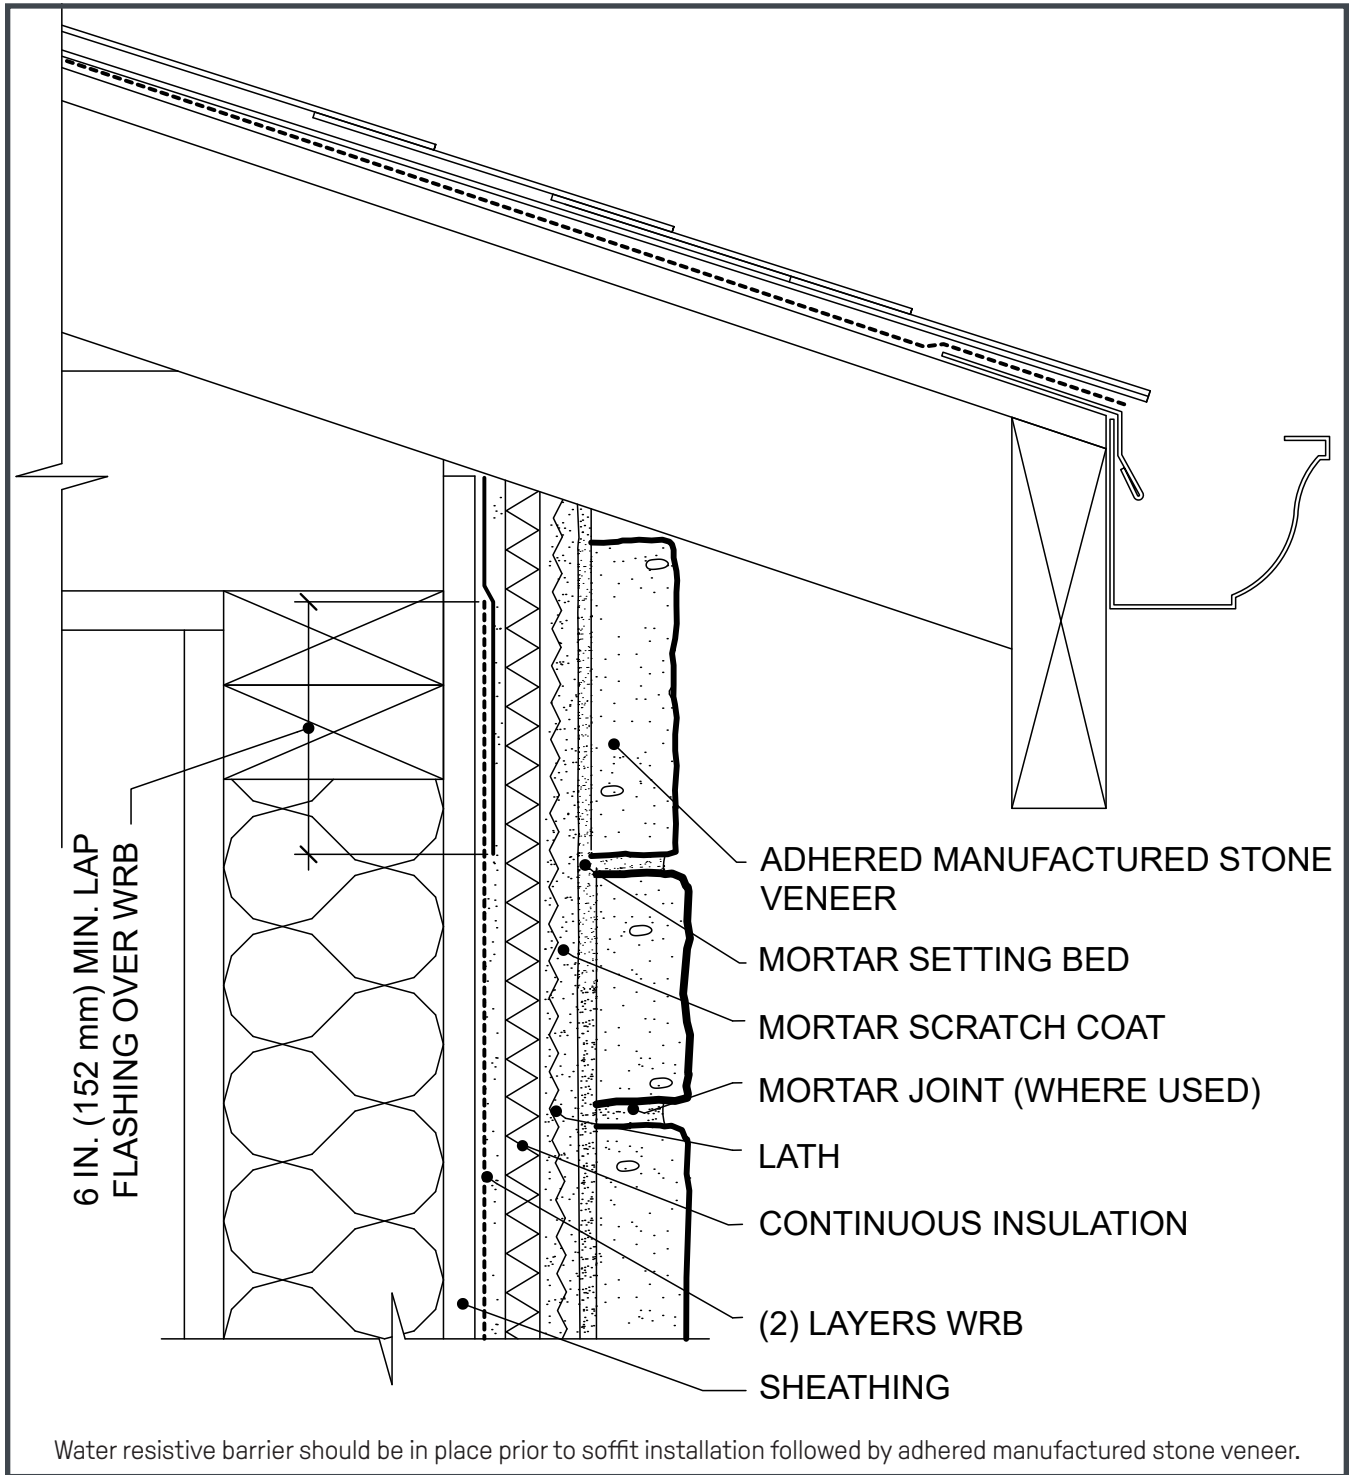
Open Eave - Overhang Over Continuous Insulation
